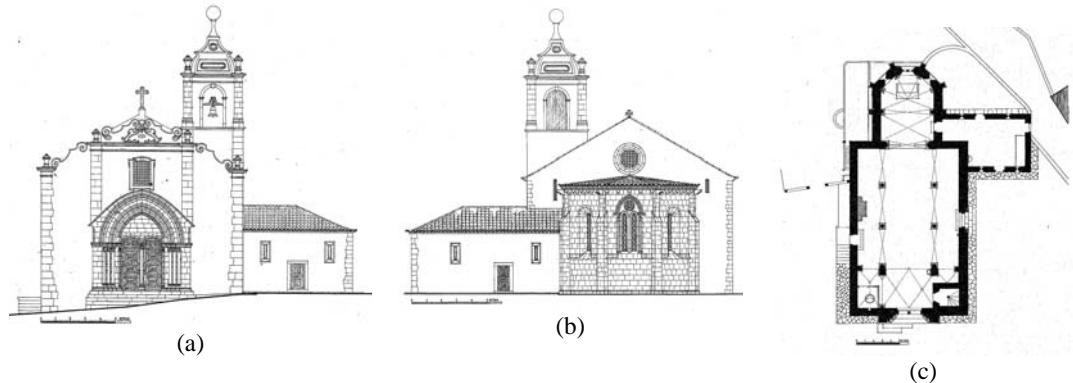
Geometry: (a) main façade; (b) back façade; (c) plan.
